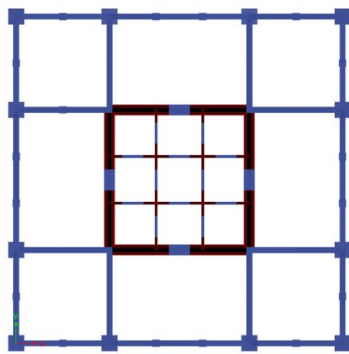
Plan view of orthogonal oriented outrigger trusses
